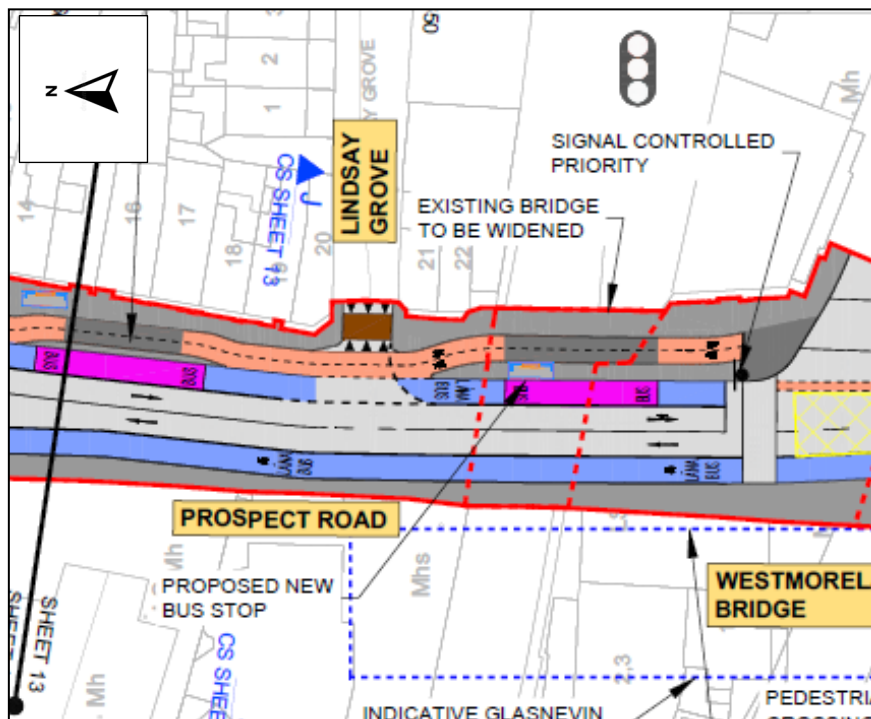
Extract from General Arrangement Drawing Sheet 13 at Prospect Road
